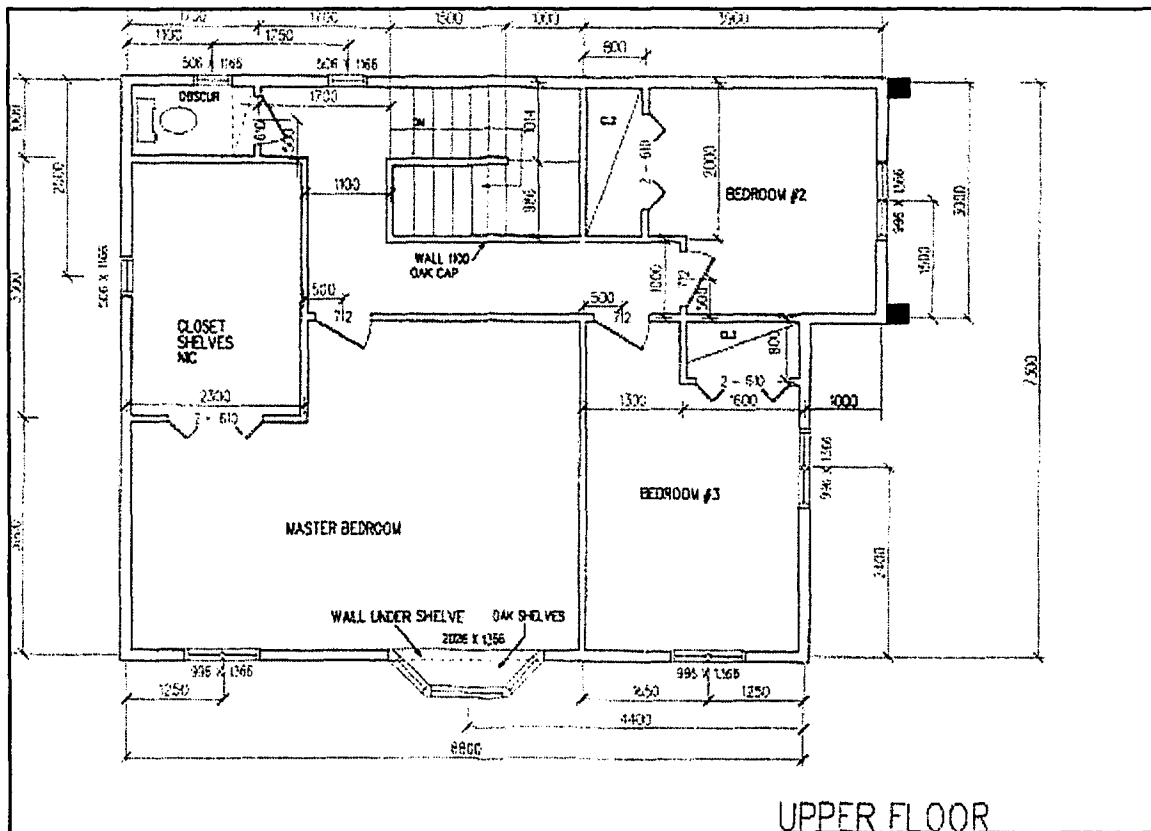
Second floor plan of house for Japanese client (Modulx Inc.,1996)
